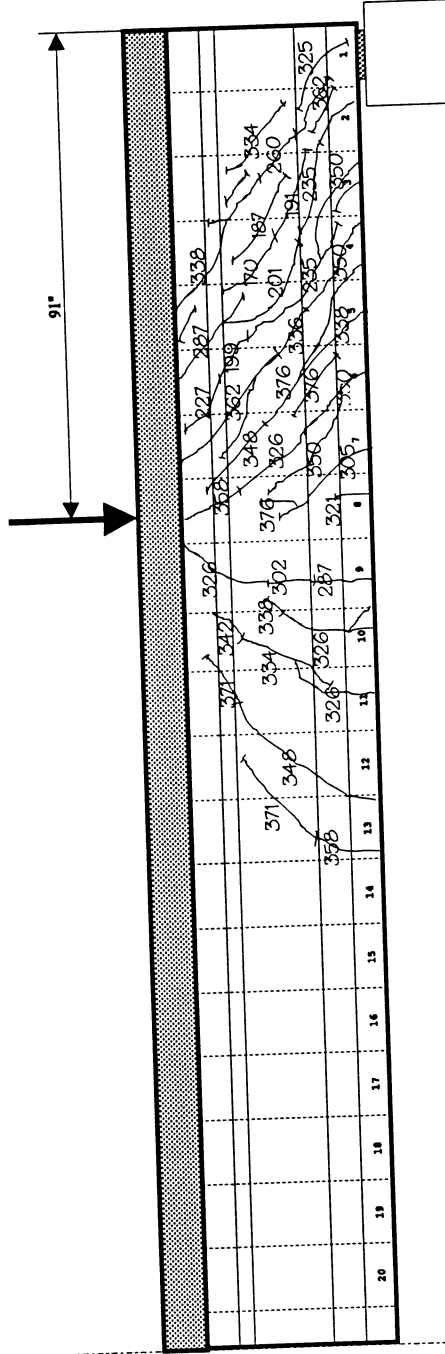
Cracking Pattern for Girder 2R-8-S
